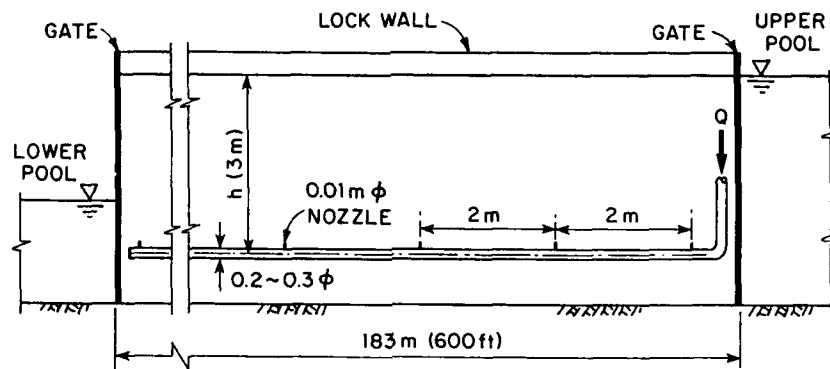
Manifold dimensions for an assumed diffuser pipe.
